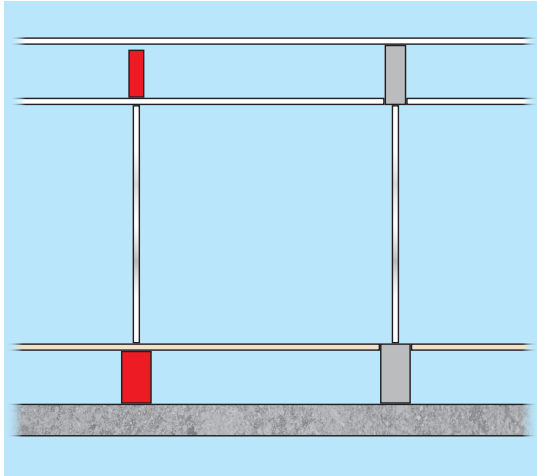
Glazed fire screens should be installed through any ceiling and raised floor to a suitable supporting construction capable of accommodating the weight of the glazed partition and any traffic that might pass through any openings.
